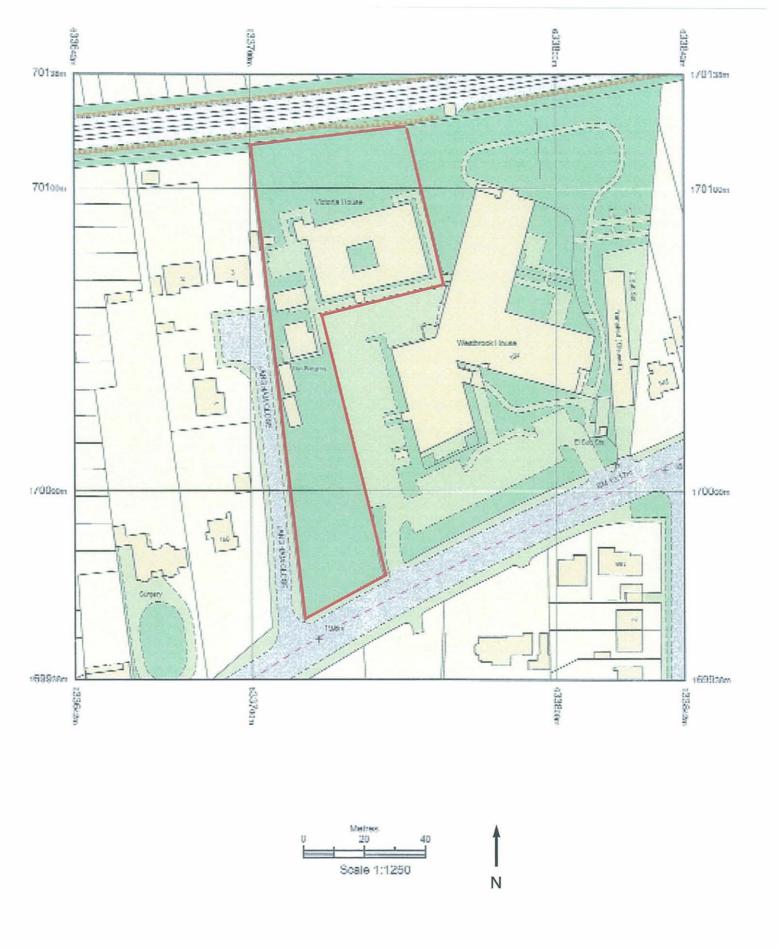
Location of site of proposed development at Victoria House, Canterbury Road, Westgate, Kent. (NGR 633728 120077).
